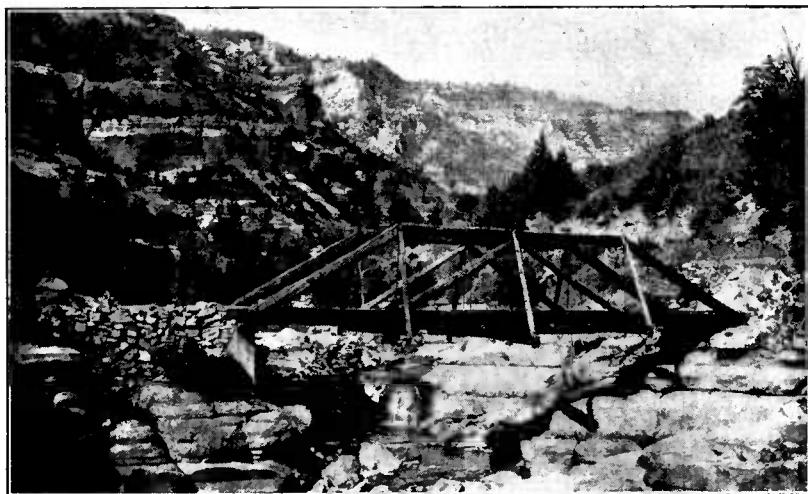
A log bridge of 40-foot span. Such a structure can not be built by an amateur
